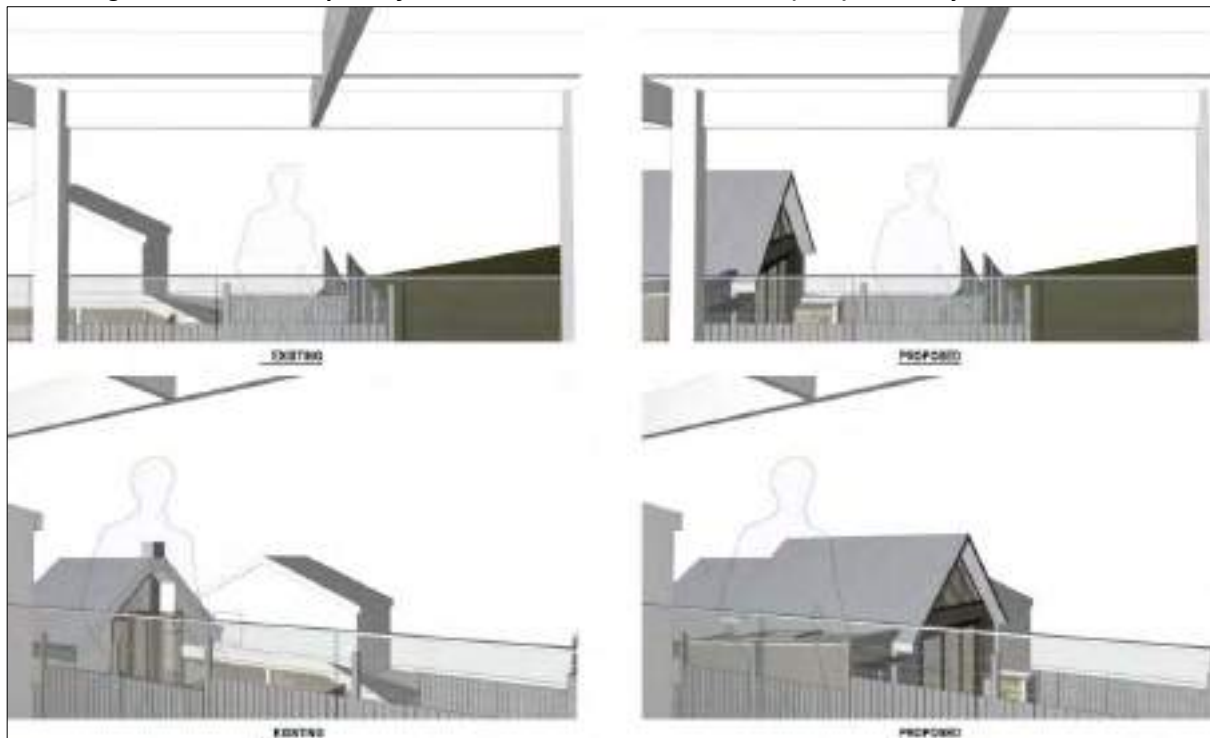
View towards rear sundeck of 36 Eureka Street from subject site, showing level difference between the sites
